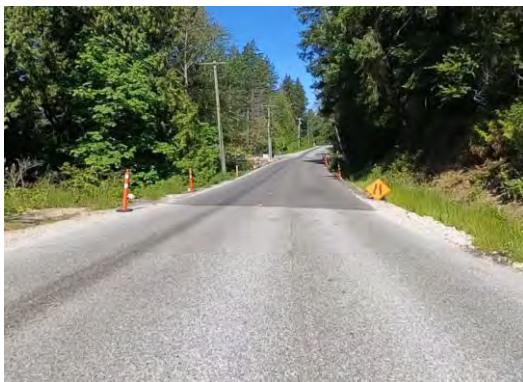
Redrooffs Rd – Looking west towards culvert crossing
